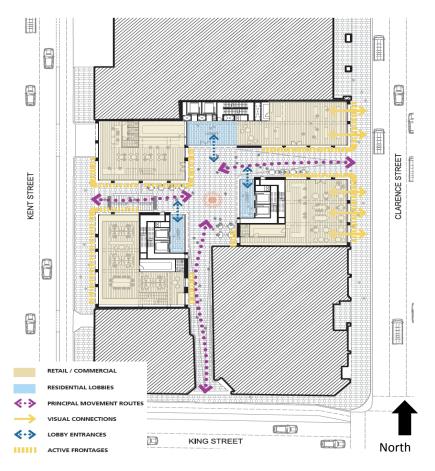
Ground level publicly accessible pedestrian space (centrally located between the podium blocks) and laneways
